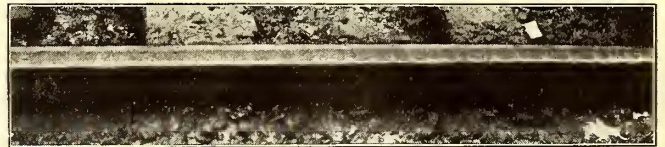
Corrugated Rail Near Station on Berlin Steam Belt Railway
